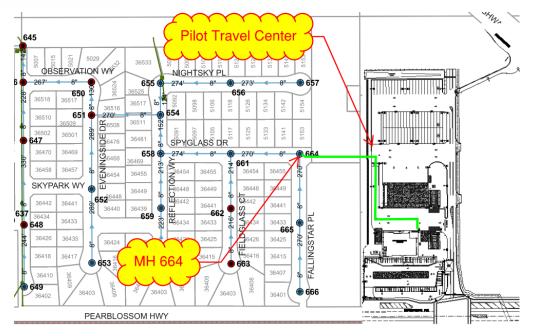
Pilot Travel Center Connection to Ex. Sewer
